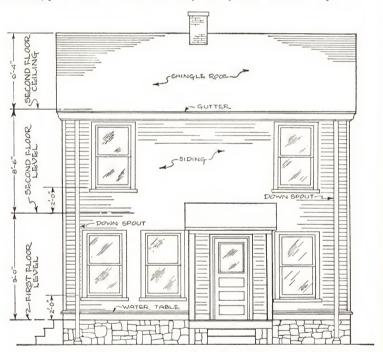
Working Drawing for Elevation View Shown in Fig. 94
